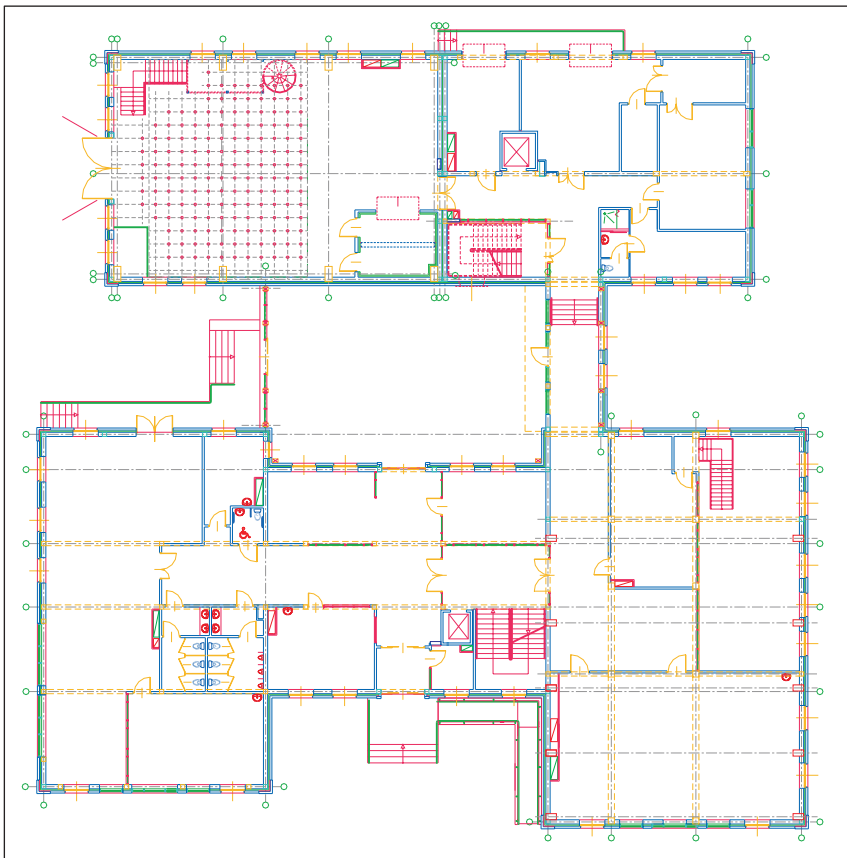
The ground floor plan. Author: M. ZAGROBA
